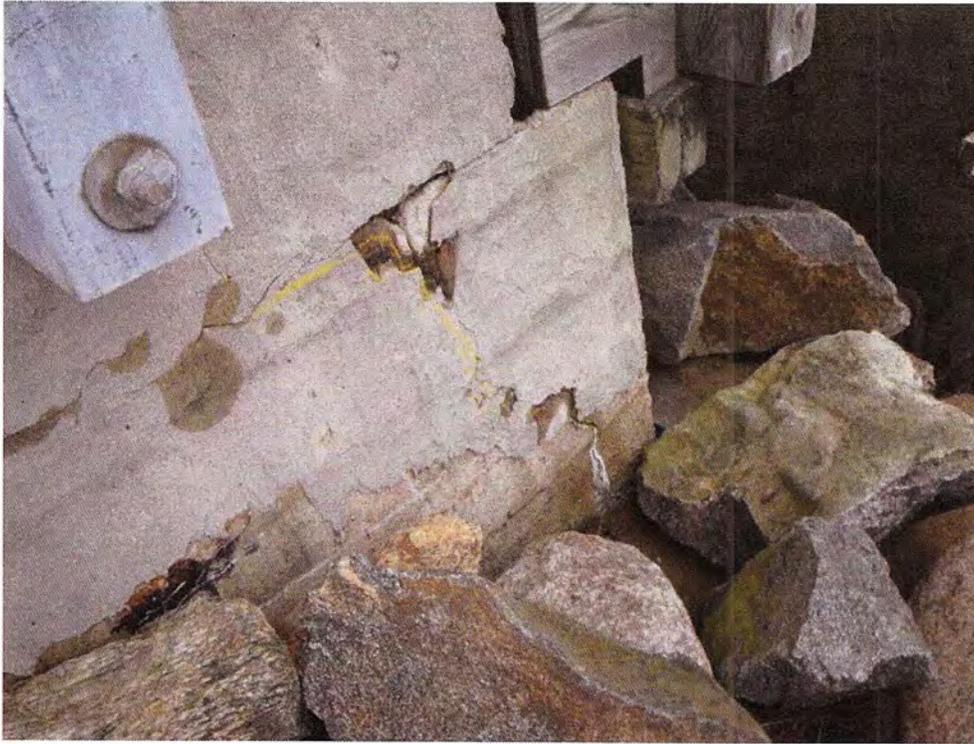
12" wide by 9" high by 6" deep spall at the south end of the east abutment backwall.
